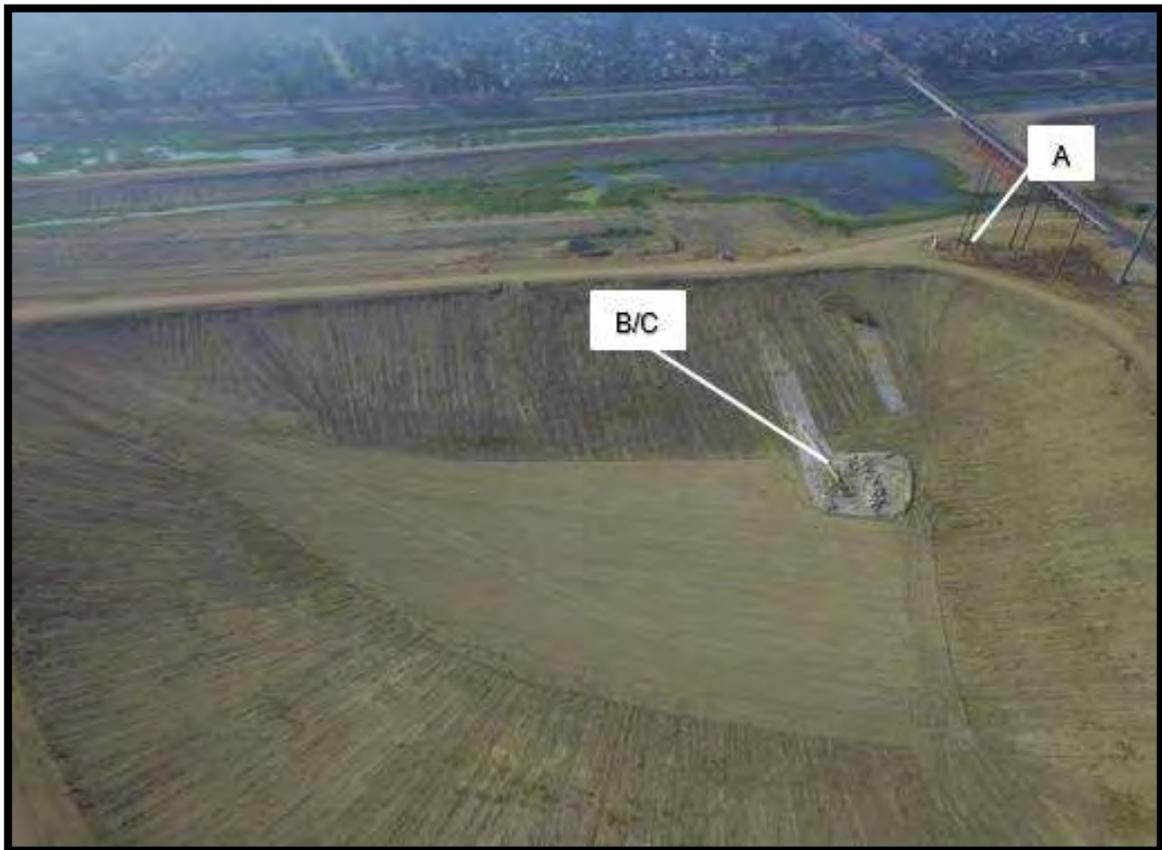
Aerial image of Olive Basin showing the (A) dewatering pump control building, (B) sump pump intake structure and (C) basin inlet portal.
